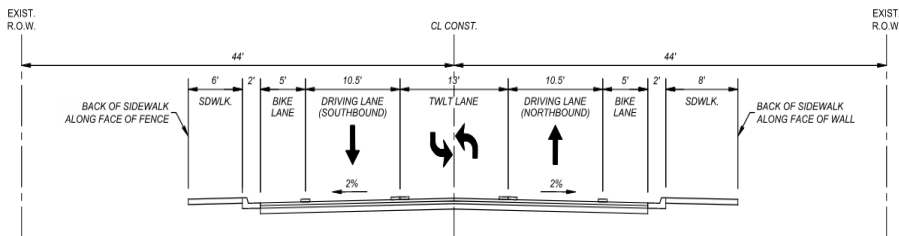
, Proposed Typical Sections from Fire Station Road to Siringo Road – Build Alternative 2
